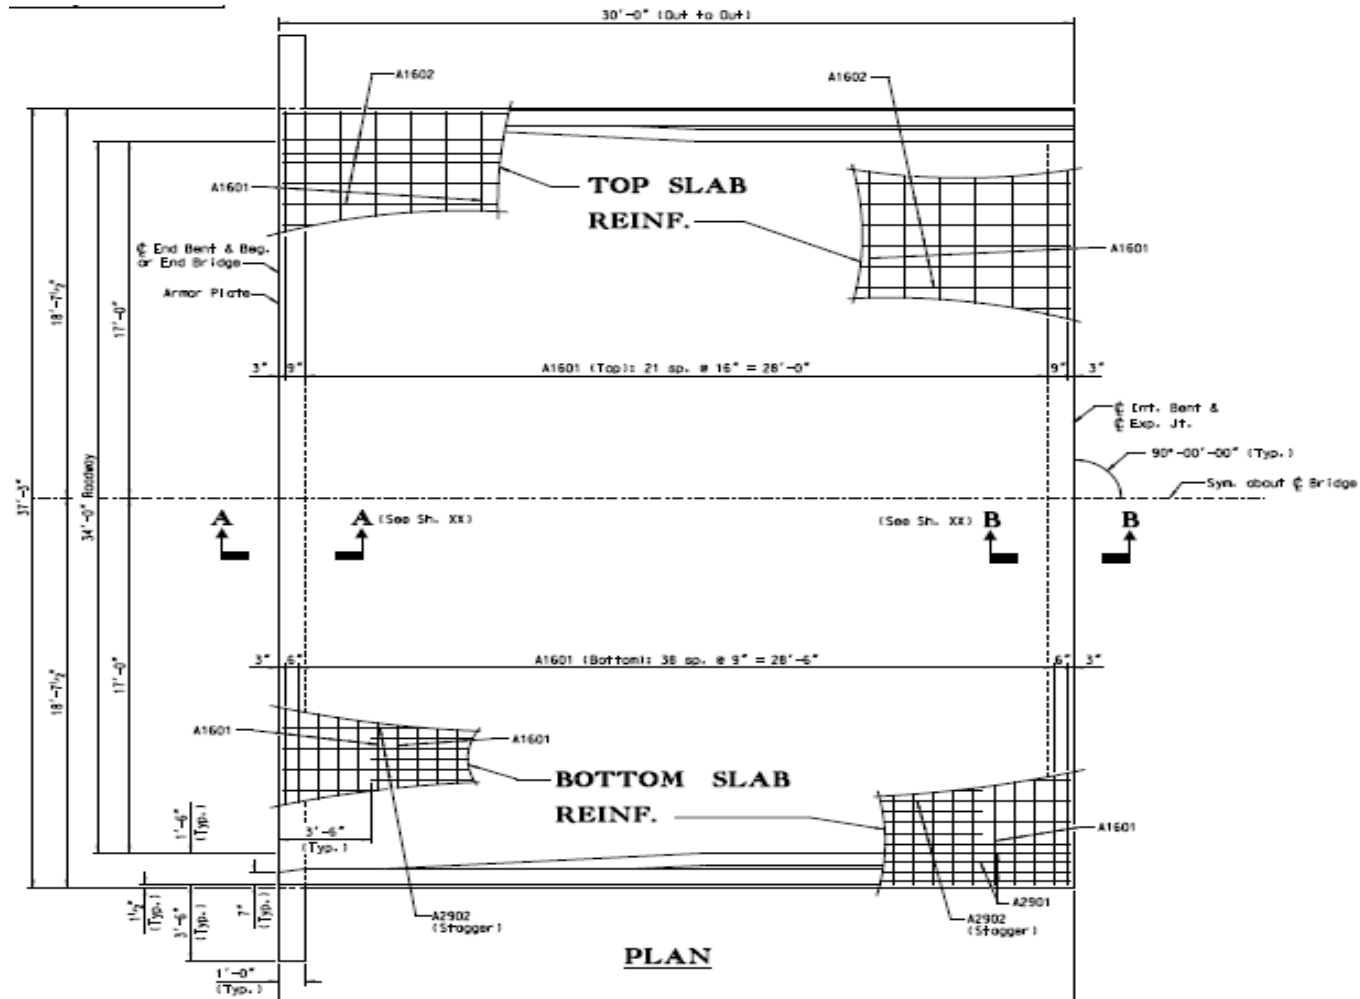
Plan View of Archetype 1 Bridge (SCDOT 2011).
